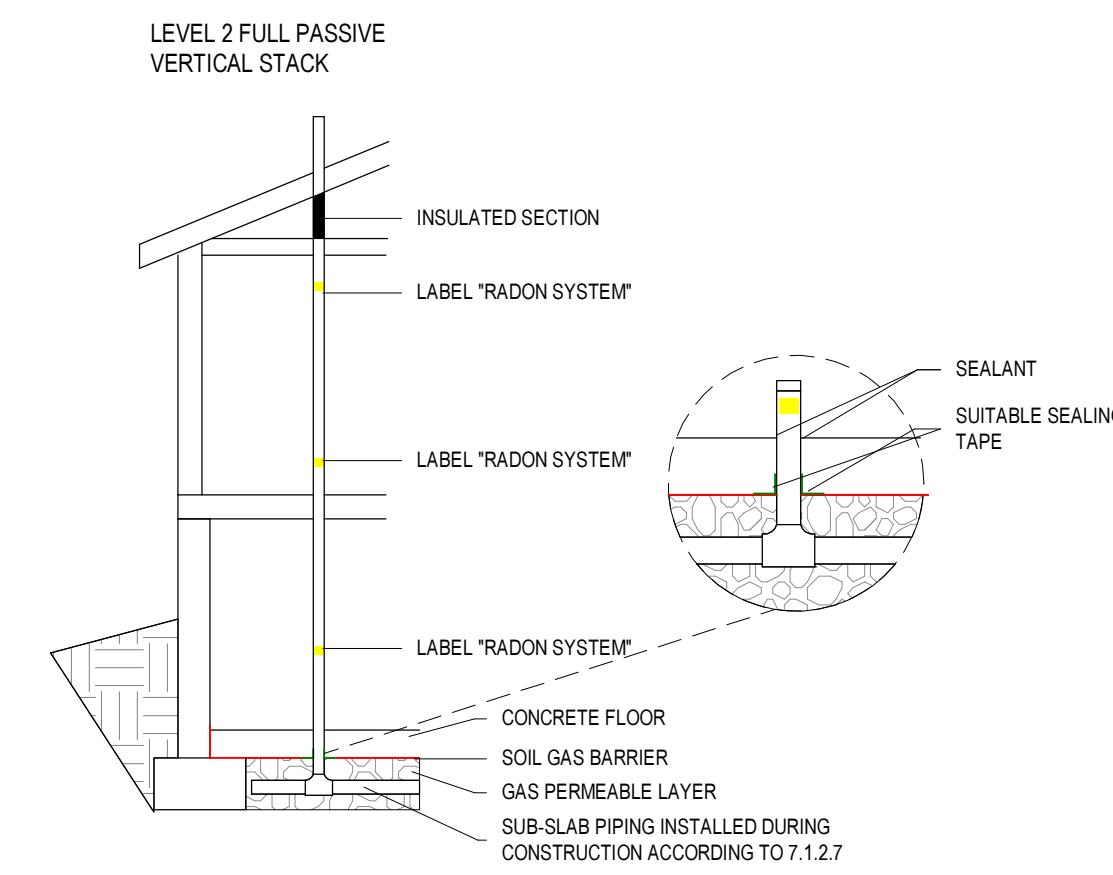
LEVEL 2 - FULL PASSIVE RADON STACK
